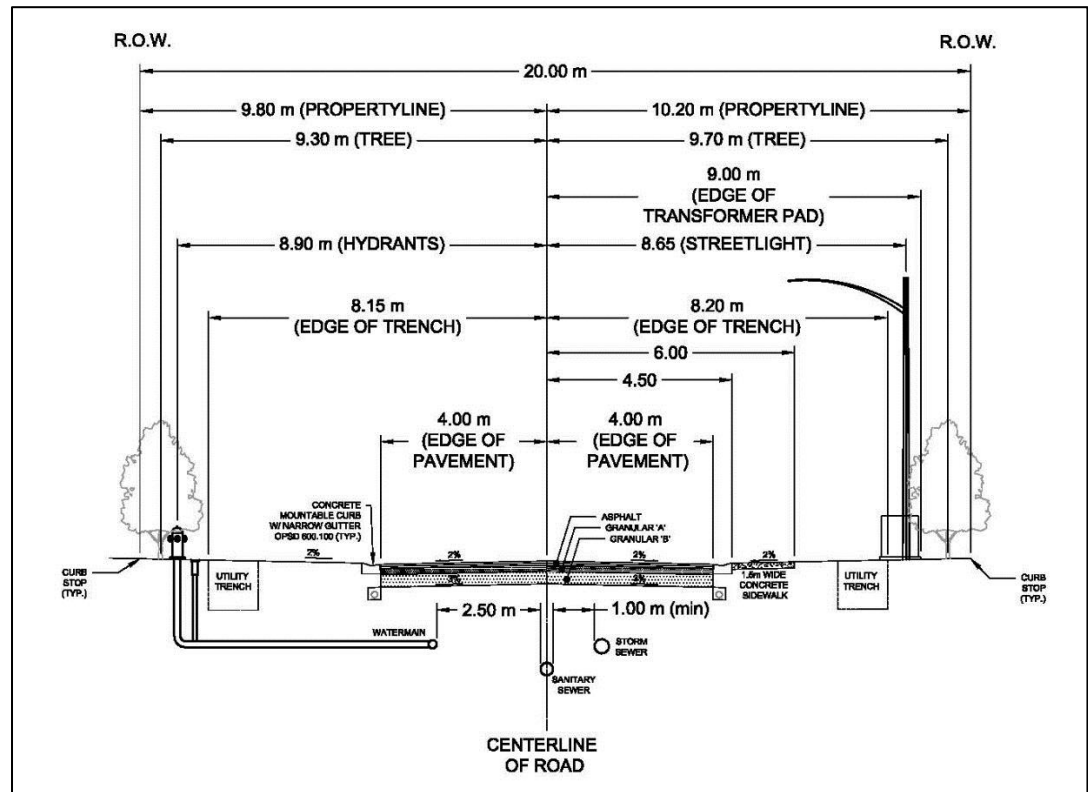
Sample cross-section of proposed "Local Road" proposed for Streets 'A', 'C', 'D' and 'E' (IBI Group)
